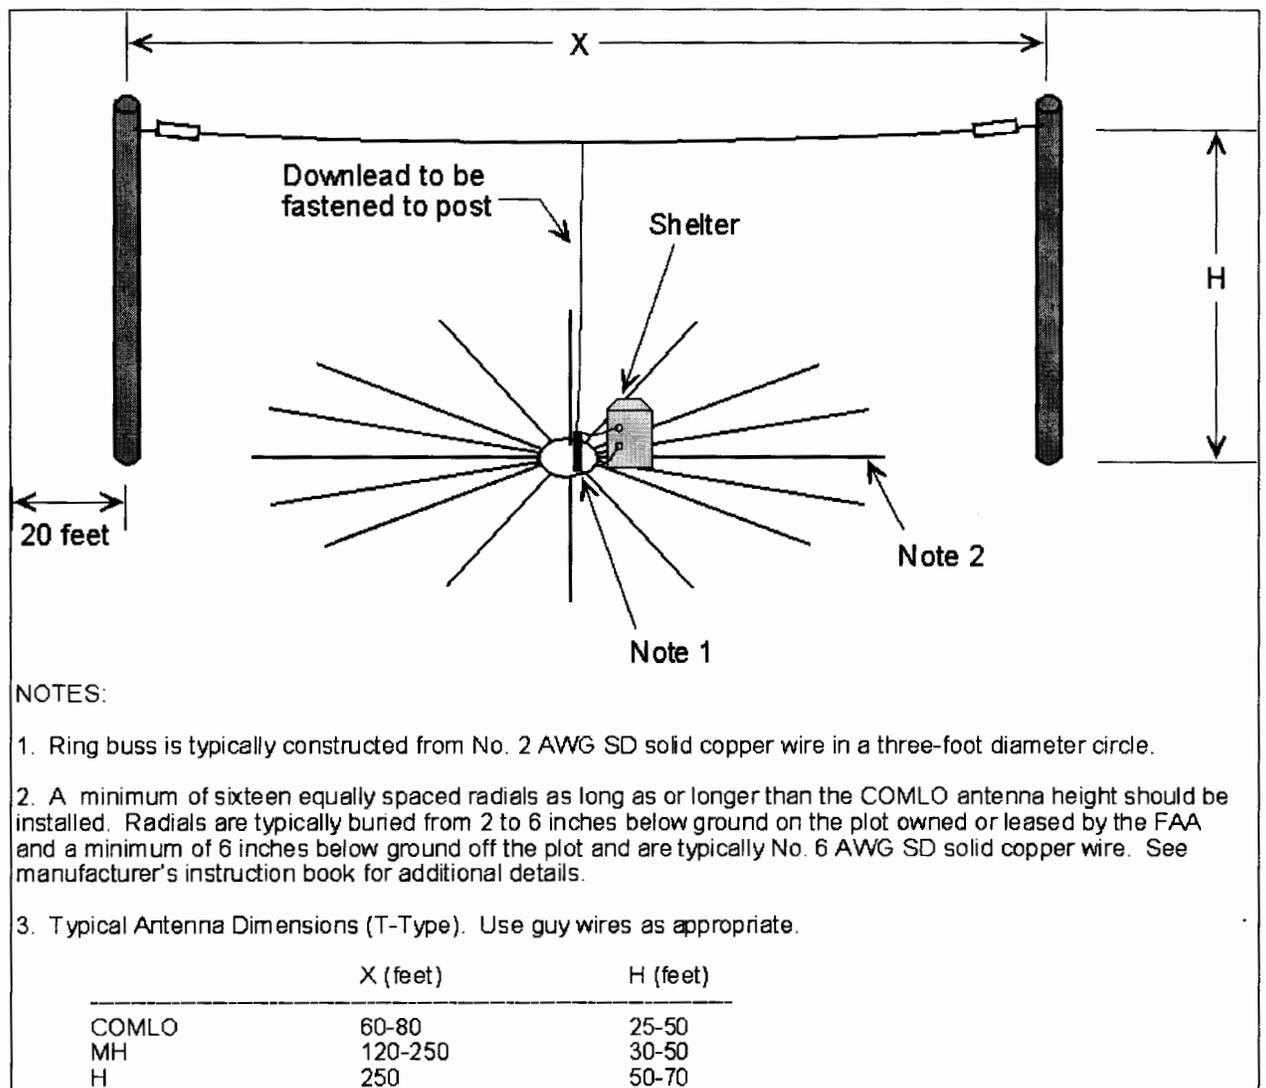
Typical NDB Layout and Plot Size Requirements
